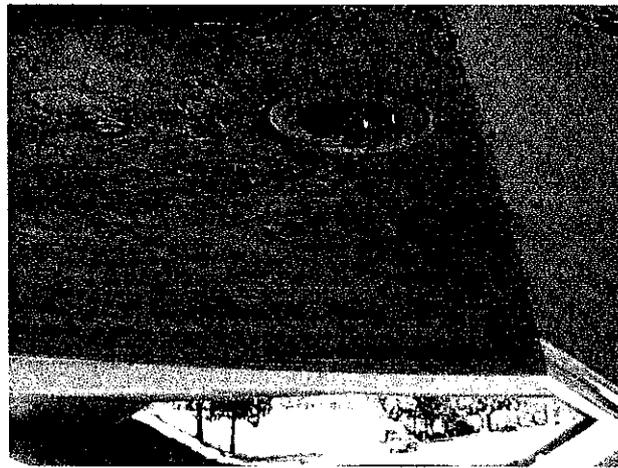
Bridge 29-0215L/R drains (non-suspect)
